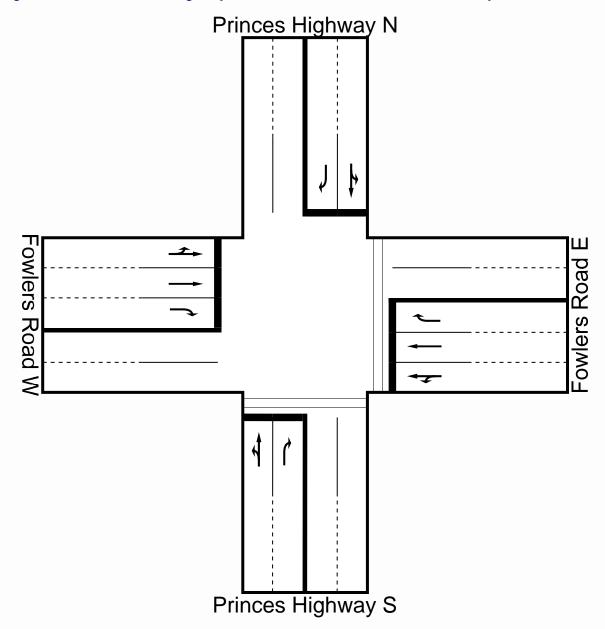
Princes Highway/Fowlers Road 2008 Intersection Layout
